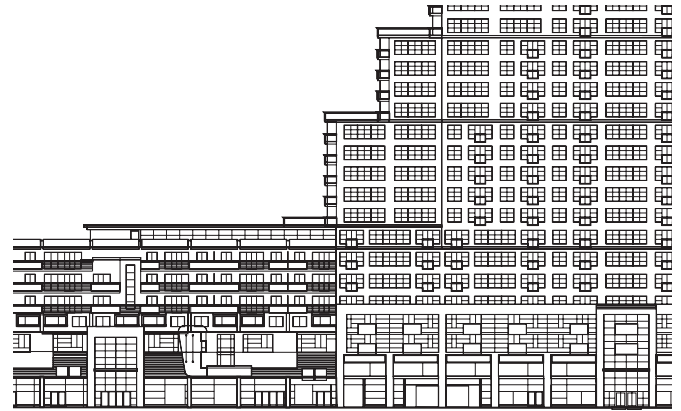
Stepbacks of upper floors create appropriate transition to open space, adjacent buildings and the street edge.
